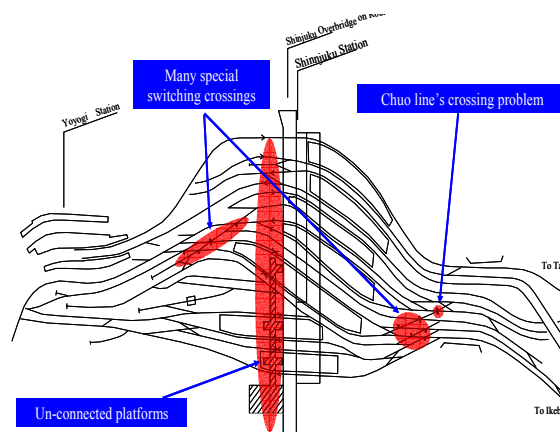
The issues to be considered for the improvement plan of Shinjuku Station
